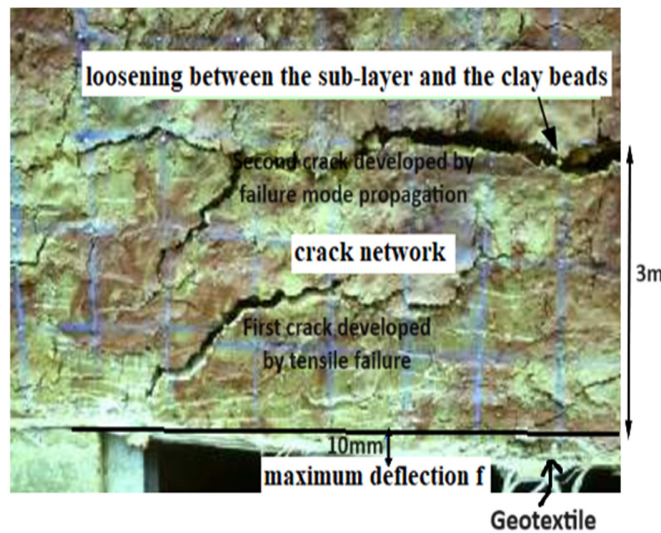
Deflection of geotextile, the sub-layer and cracks by tensile failure.
